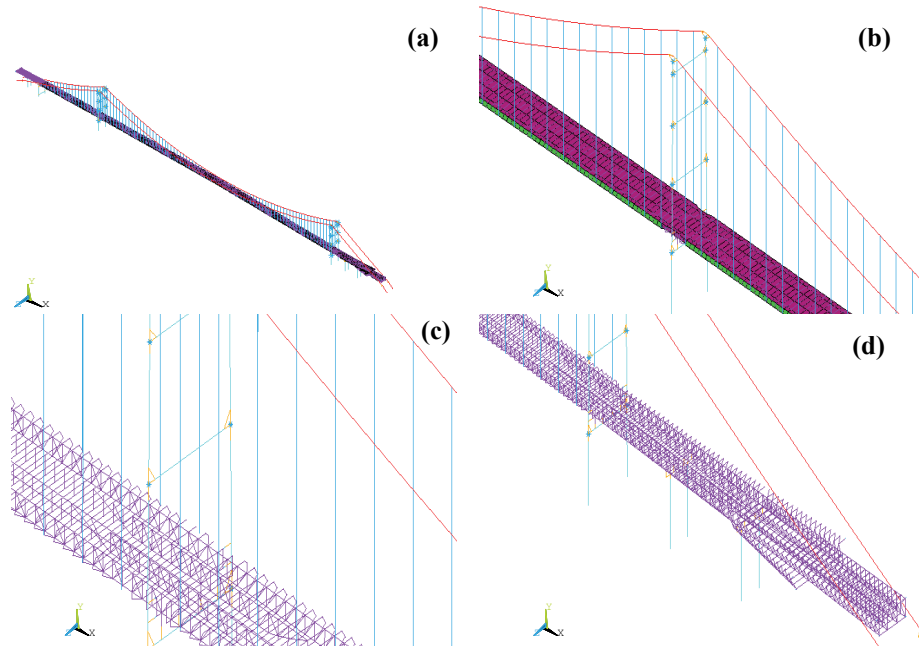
TMC FE model: global overview (a); deck and Ma Wan tower (b); additional longitudinal trusses near the Ma Wan tower (c); Tsing Yi span (d)
